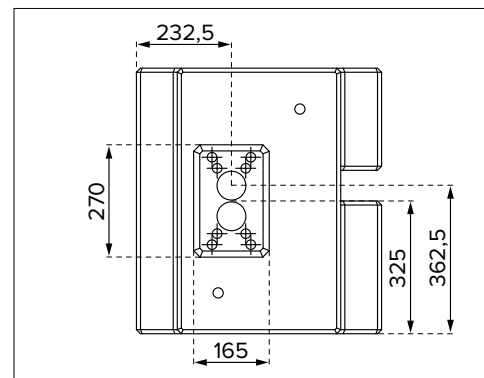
Dimensions of prefabricated foundation [mm] - Top view
